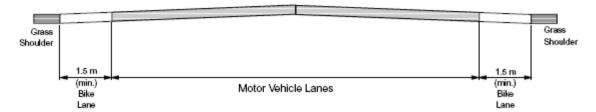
Typical Bike Lanes Cross Sections – lanes are typically marked with paint and adequate signage is provided. (Source: Florida Bicycle Facilities Planning and Design Handbook, Chapter4, 2000) distance and low pedestrian/bike traffic are encountered. Heavily used paths with multiple user types may require 12-foot paths to insure safety. Right-of-way (ROW) should be a total of at least 20 feet, though 30 feet is a desirable measure. A one-way bicycle path can be only 5-feet wide but enforcing the one-way rule may require close enforcement. There should also be a minimum 2-foot cleared area on either side of the path and 3 feet is a recommended. (A Guide to Site Planning, Harvey M. Rubenstein, John Wiley and Son)
